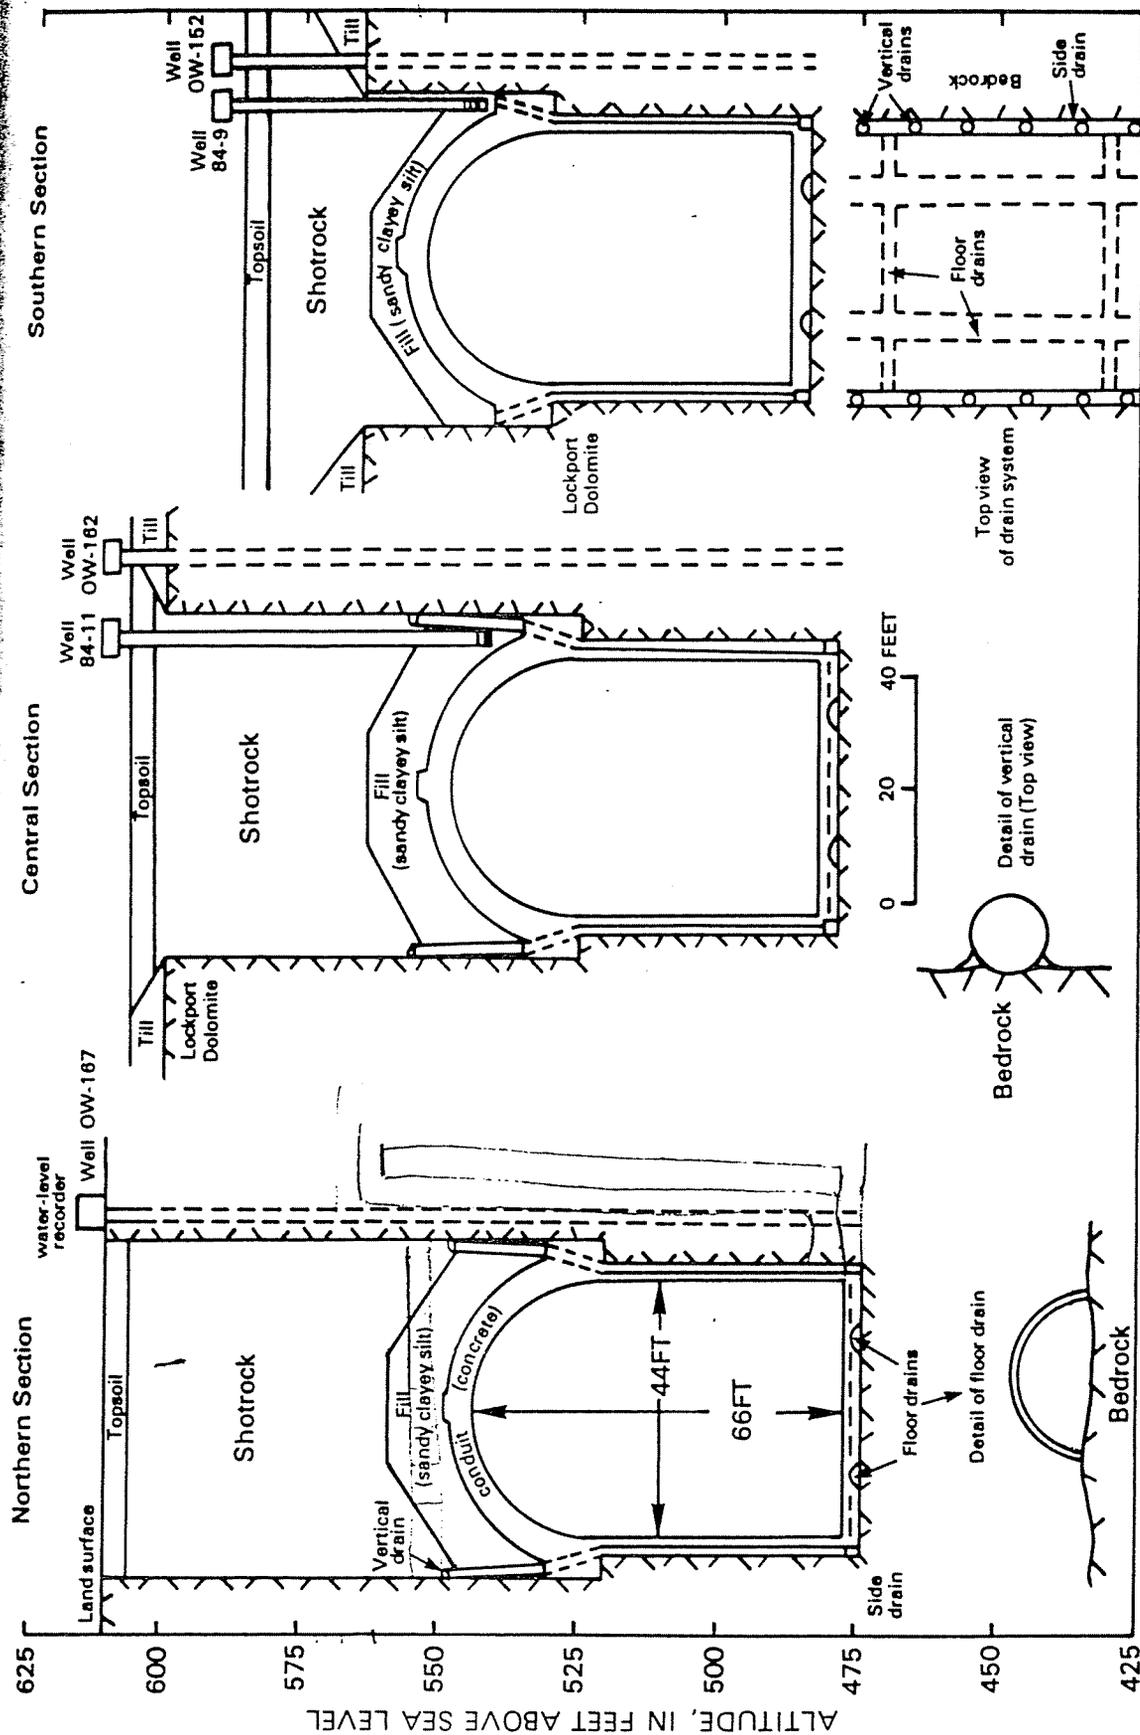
General construction details of the Niagara Falls conduits at the northern, central, and southern parts of the conduit system. (Modified from Uhl, Hall and Rich, 1961.)
